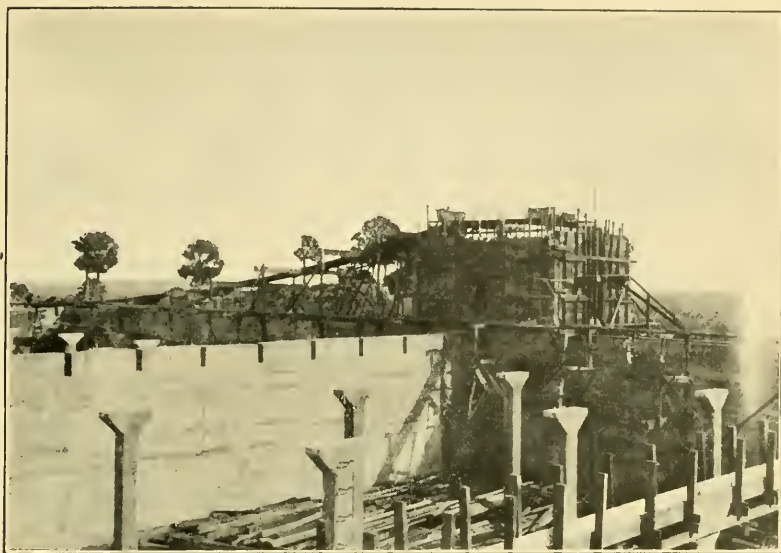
THIS PICTURE SHOWS THE HOLES LEFT IN THE WALLS FOR THE ROOF BEAMS.
